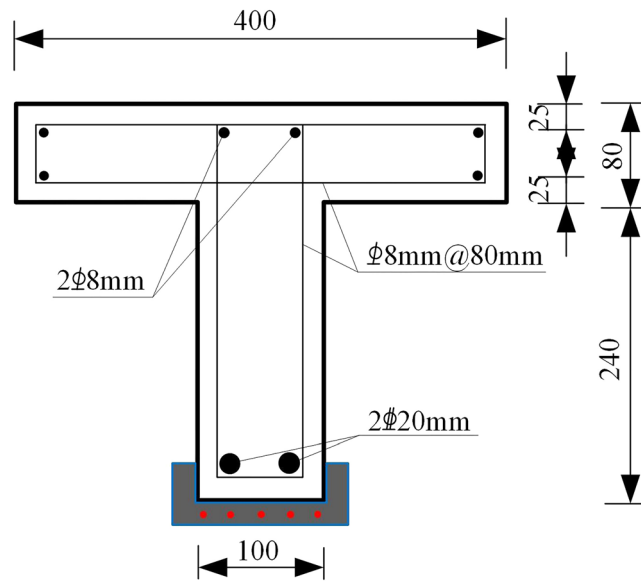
Longitudinal reinforcement diagram of the beam (units: mm).
